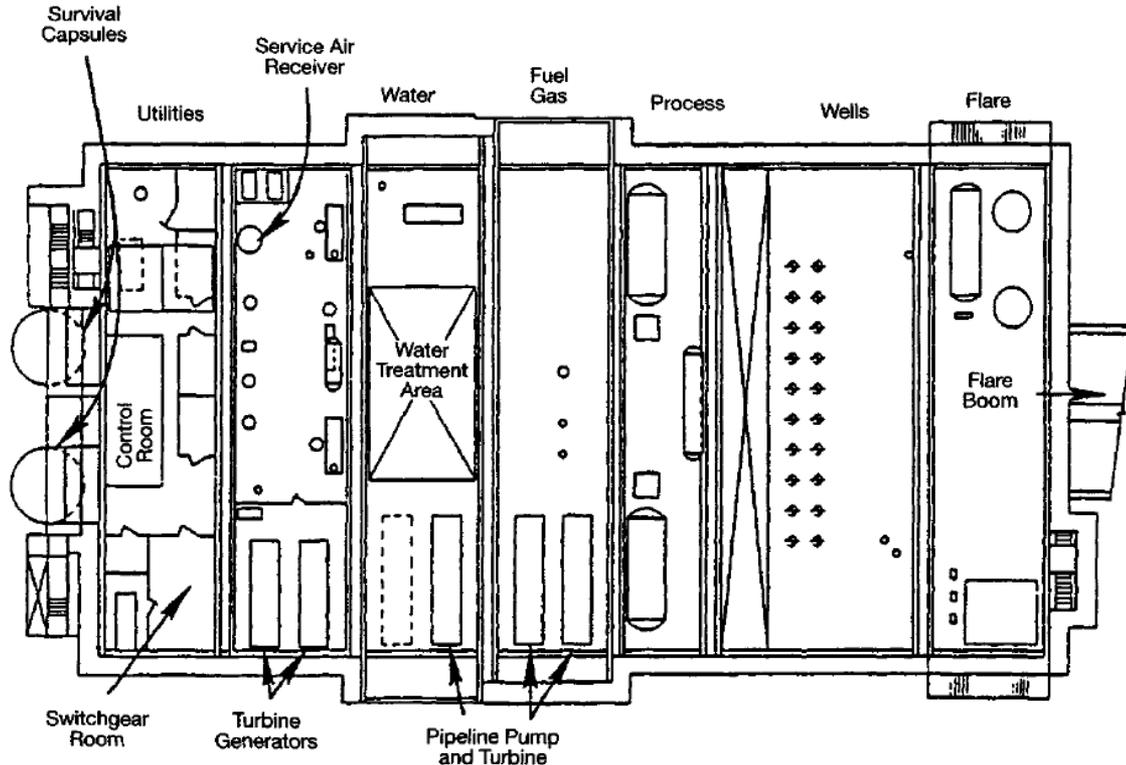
Equipment arrangement plan of a typical offshore platform illustrating the layout of the lower deck.
